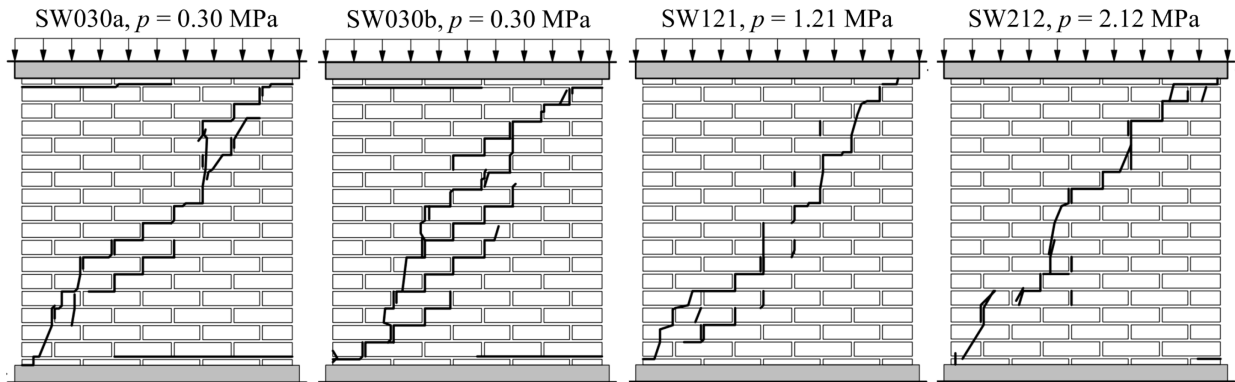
Experimental crack patterns of the different FCB unreinforced masonry shear walls.
